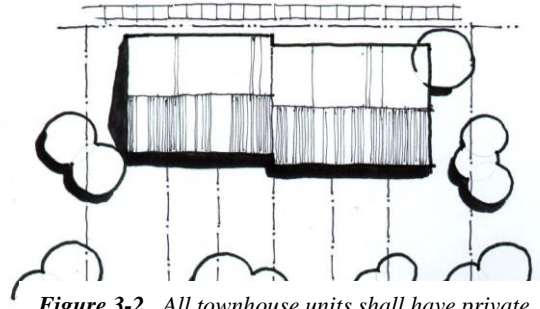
All townhouse units shall have private yard areas of at least 400 square feet.
